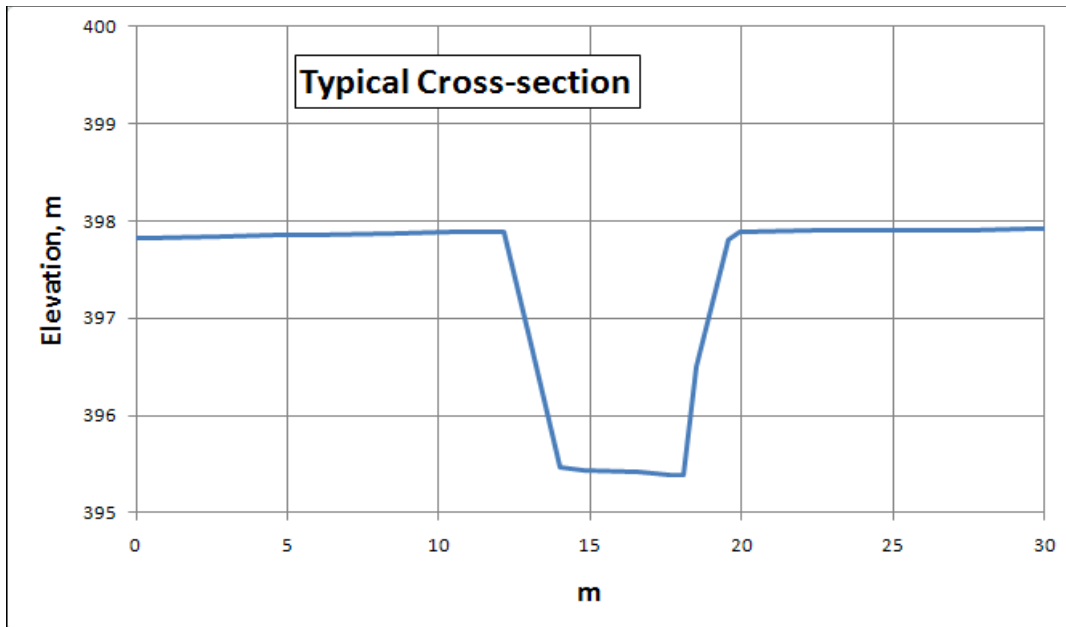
Alternative 2 typical cross-section with ditch, and without the berm.
